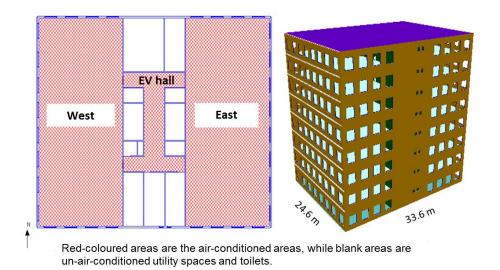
Office building model and zoning for typical 1990s type buildings (a representative floor plan and outward)
